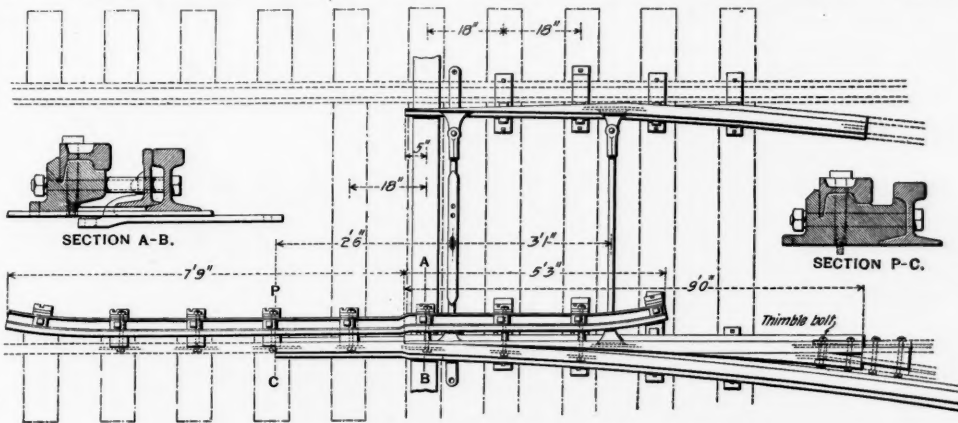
Standard Switch, Union Elevated Railroad, Chicago.
